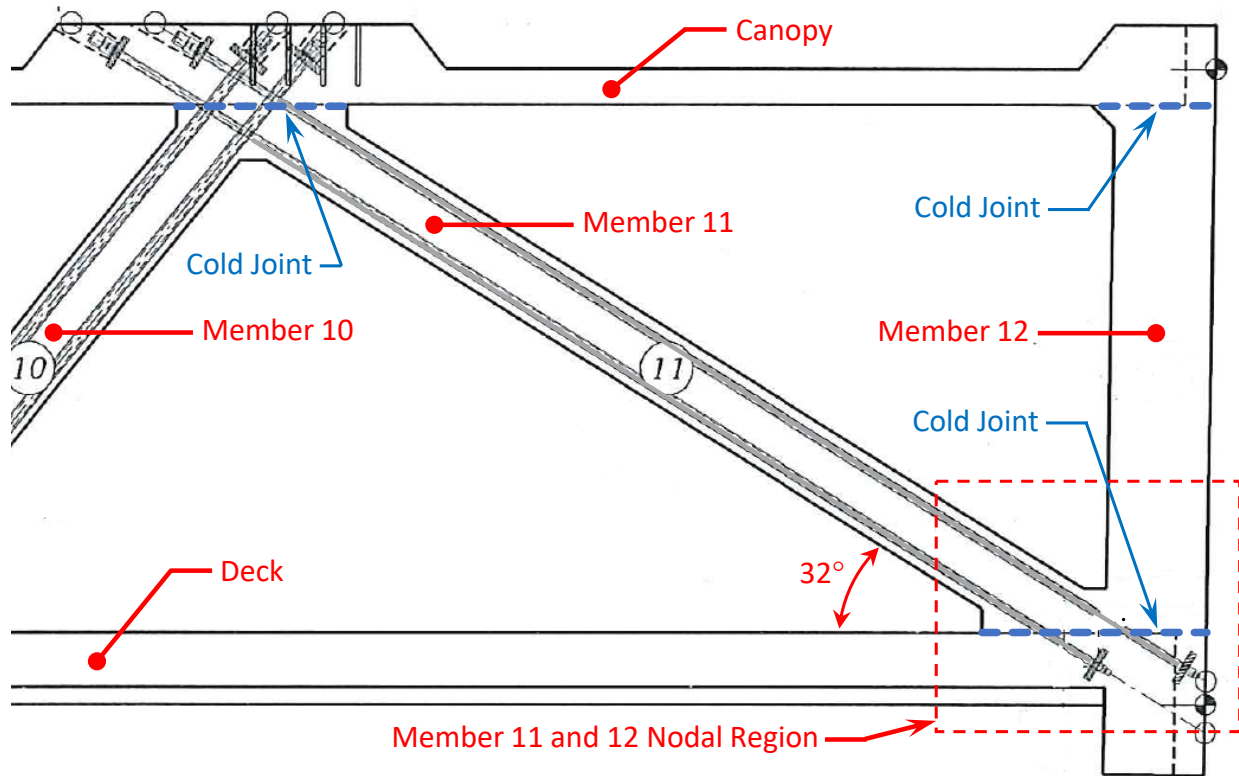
Elevation view of a vertical cross section through the longitudinal centerline of the member 11 and 12 nodal region.
